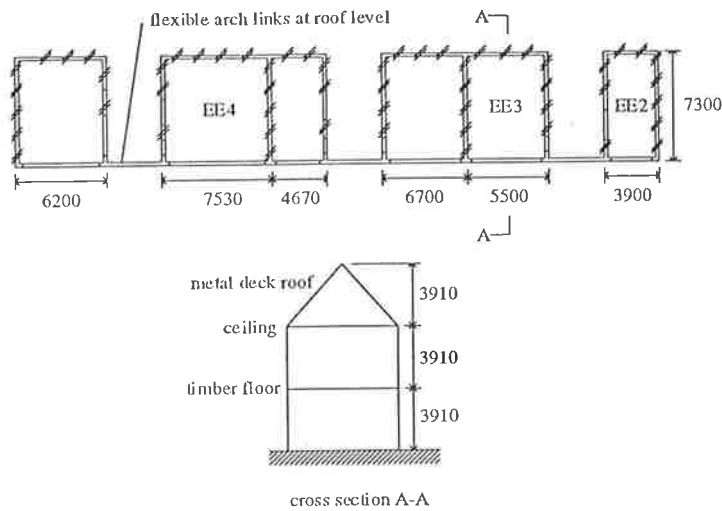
Plans of buildings EE2, EE3, and EE4.
